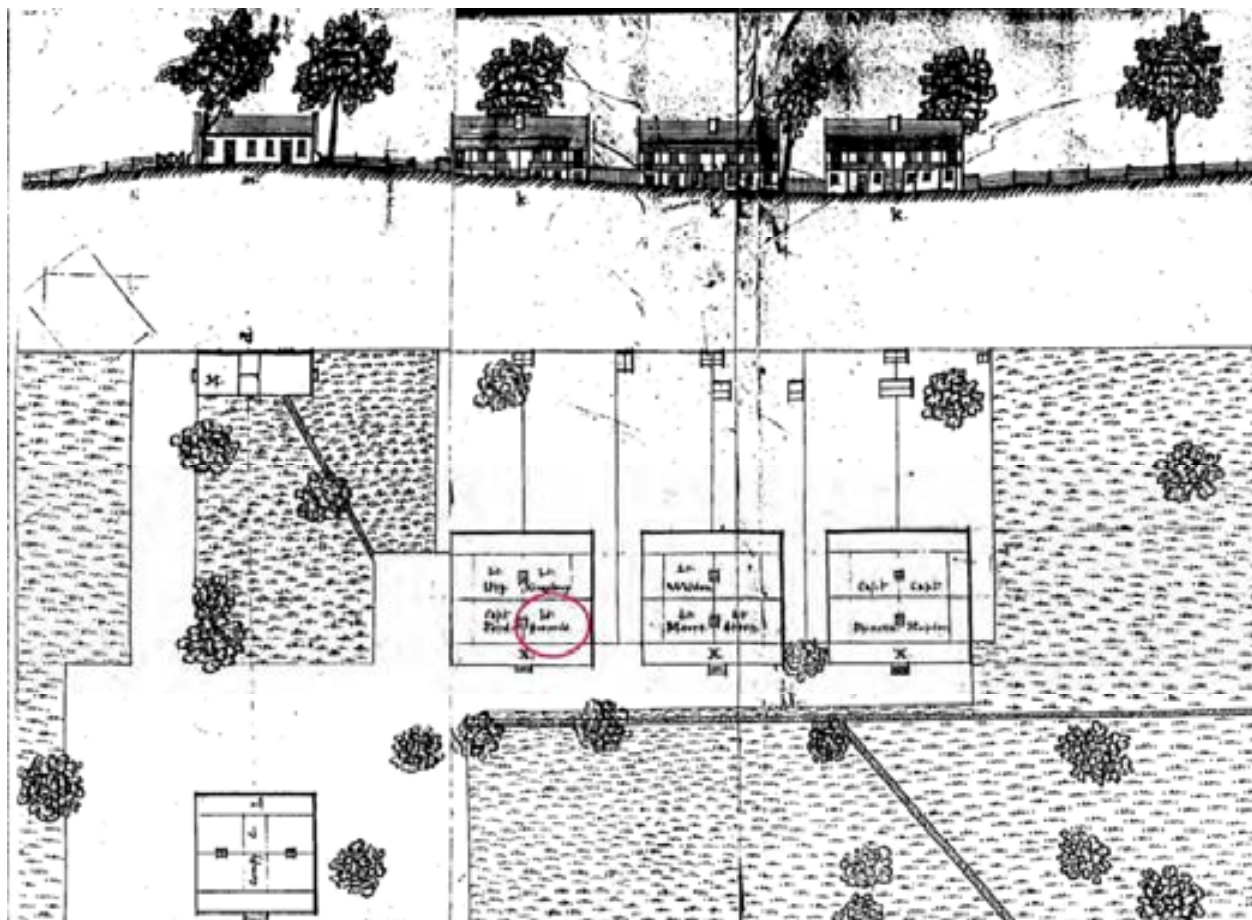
Detail of 1834 Site Plan of Fort Leavenworth with Swords duplex indicated.
